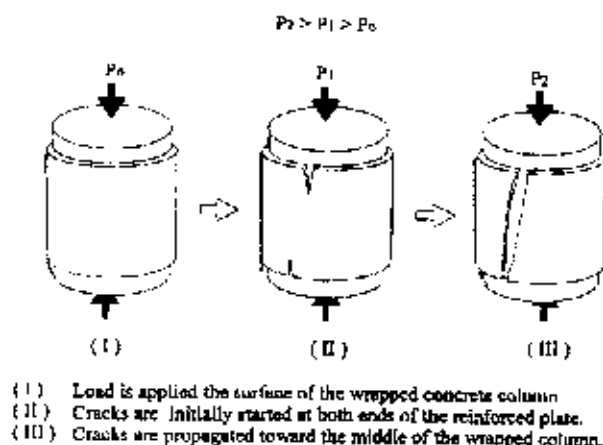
Failure mechanism of wrapped concrete cylinder subjected to compression load.
